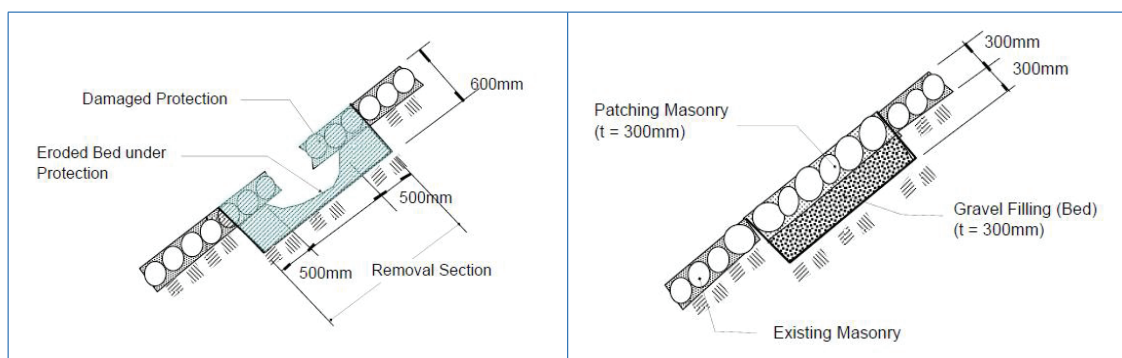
Repair requirements to damaged masonry protection
